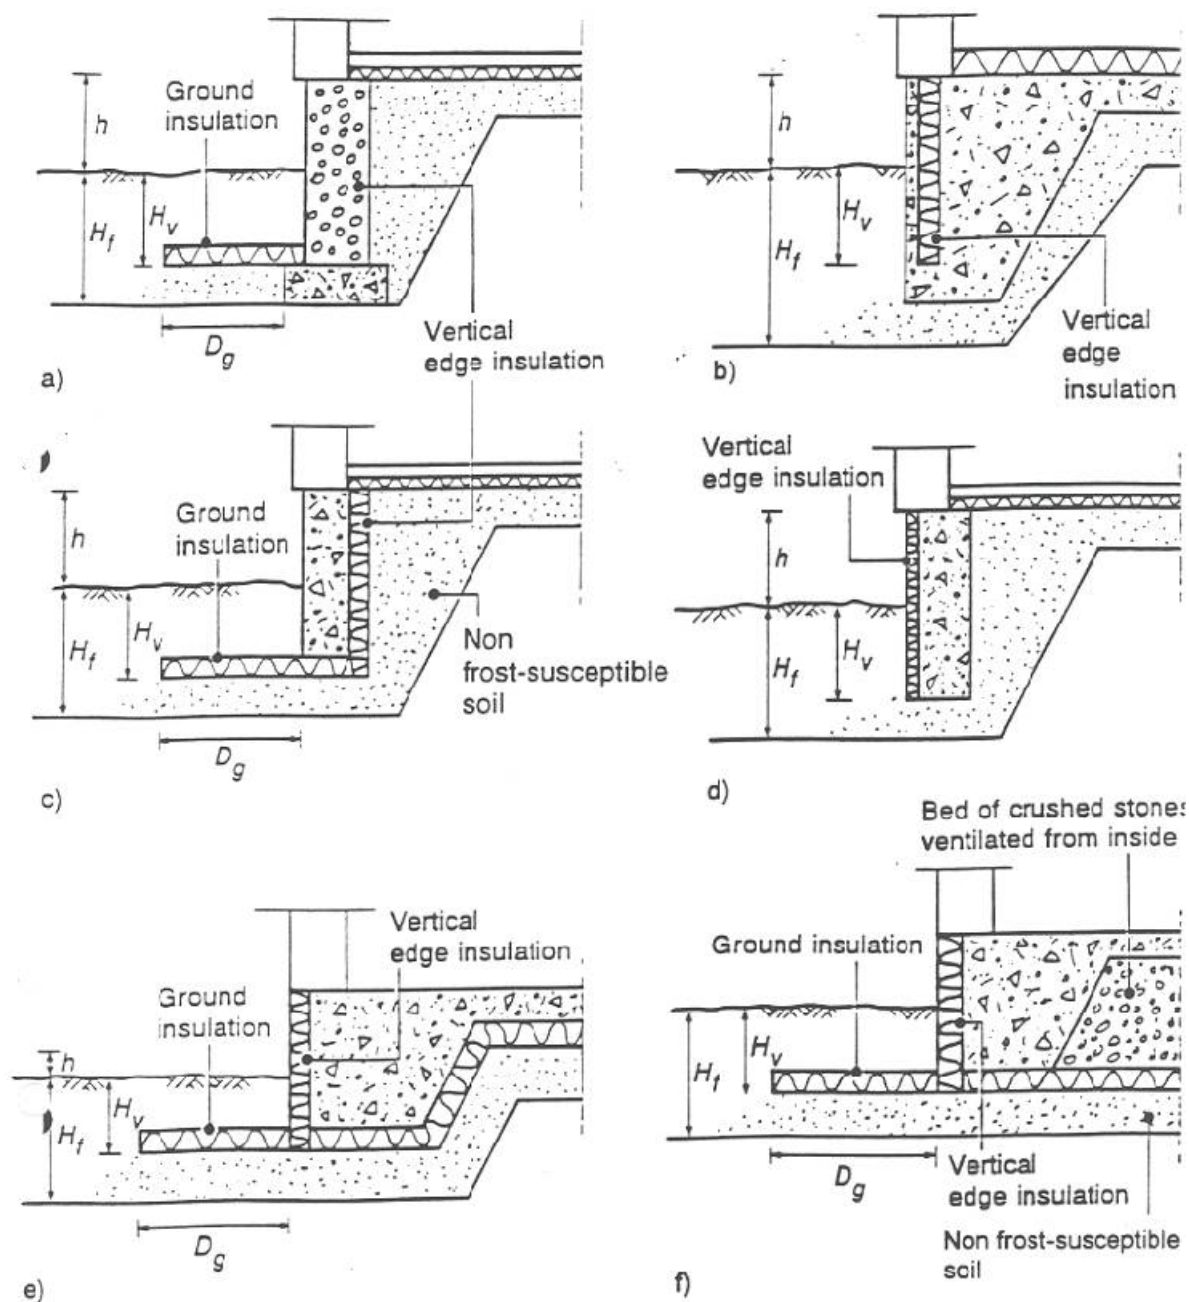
Examples of vertical edge insulation and ground insulation in foundation structures
